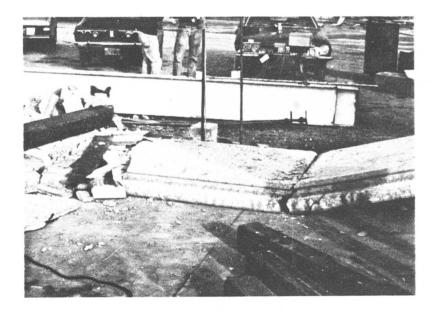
Test No. 3, Plank Failure After Load Was Removed.
